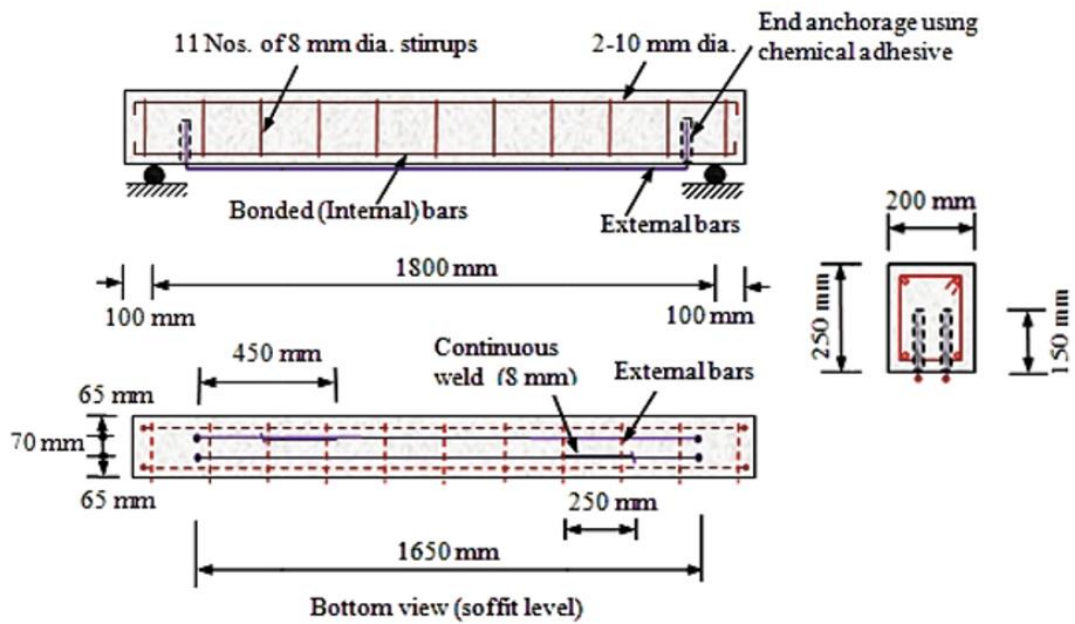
Details of the specimen (Vasudevan and Kothandaraman, 2014)
